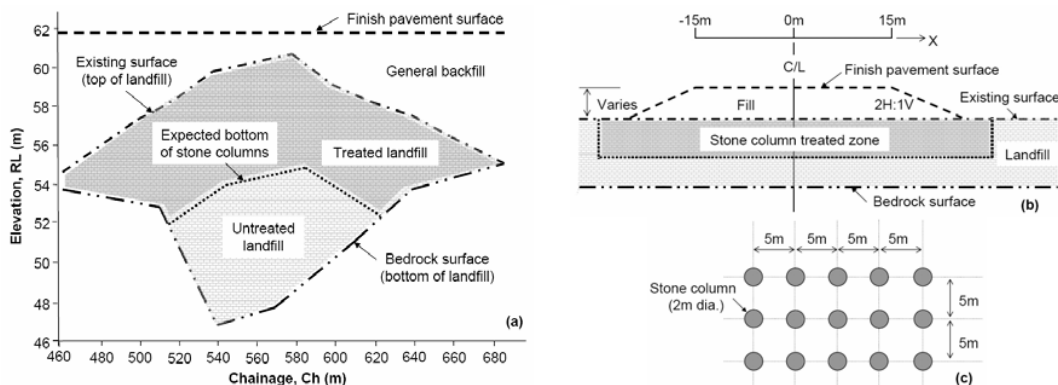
Long section (a), typical cross section (b), and stone column arrangement (c)
